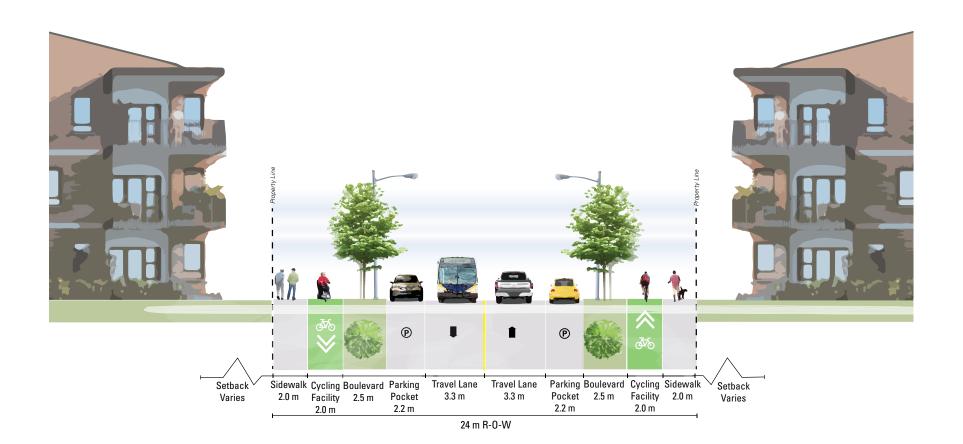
B: Unique Collector - 17 Avenue between 151 Street and 152 Street
